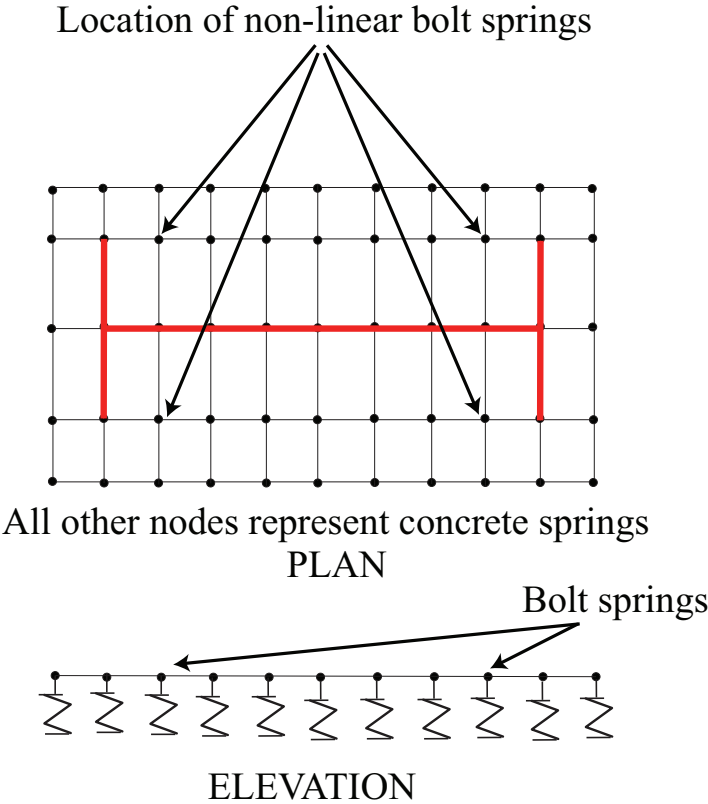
Plan and Elevation of base plate and nonlinear springs
